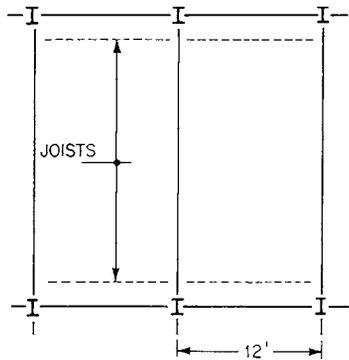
Typical short-span floor framing for a high-rise residential building.
